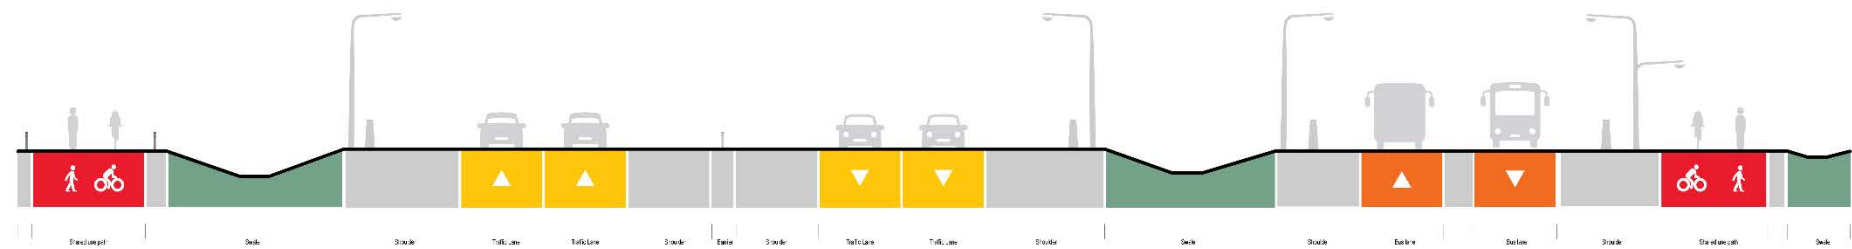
Indicative Alternative State Highway cross sections – West of Taupaki Road
